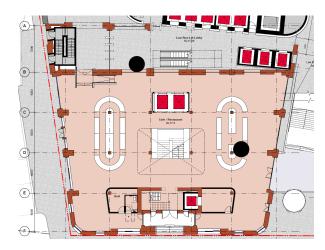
General Arrangement Lower Ground Level, Drawing no. 10GR0000
